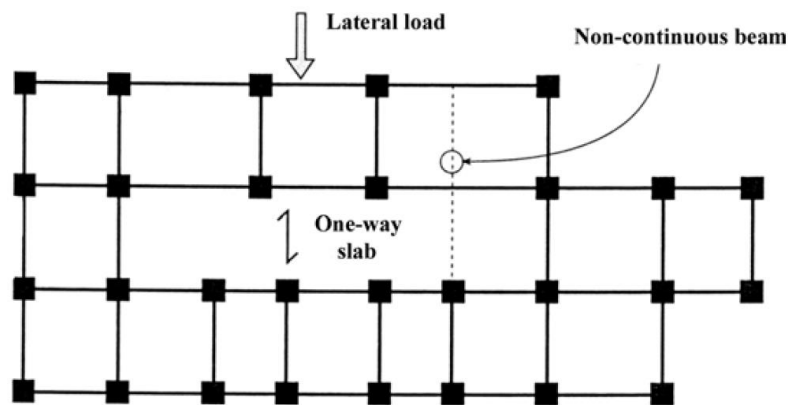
Over-Stretched One-way Slab (Özmen, 2008)
